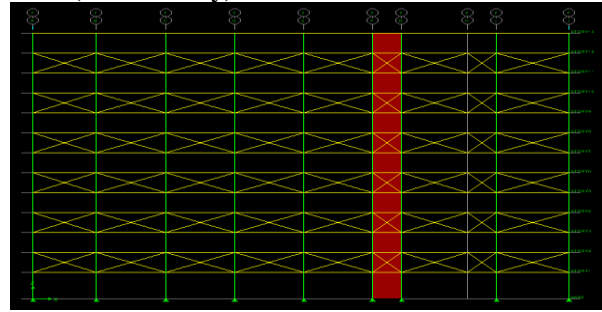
Elevation View of building with alternate bracings. (Horizontally from 2bay).
